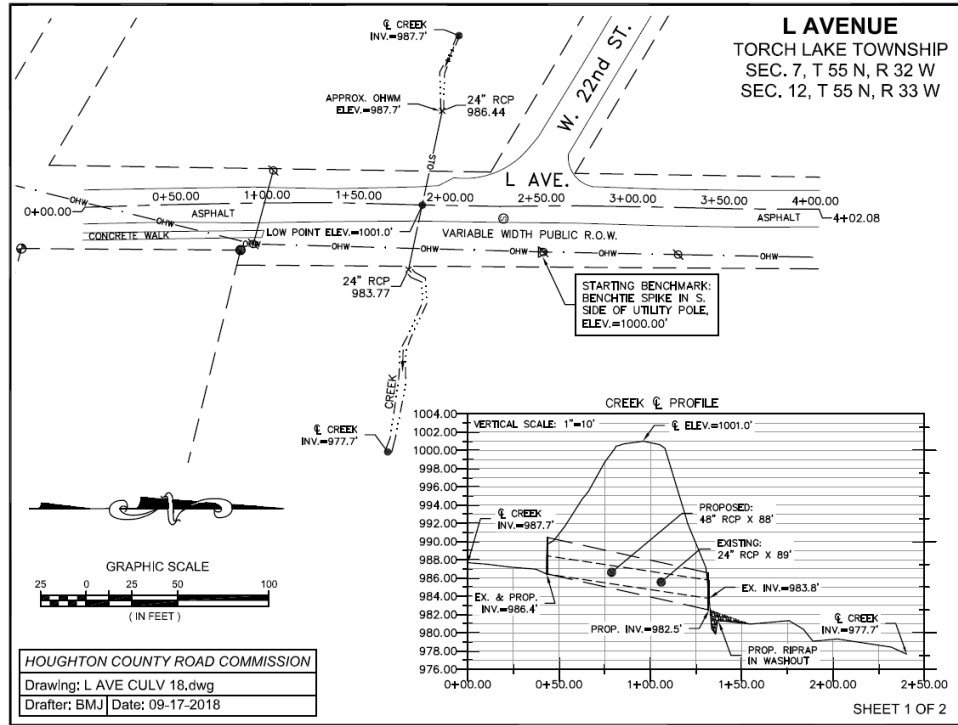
HCRC L Ave. Culvert Plan [18].
